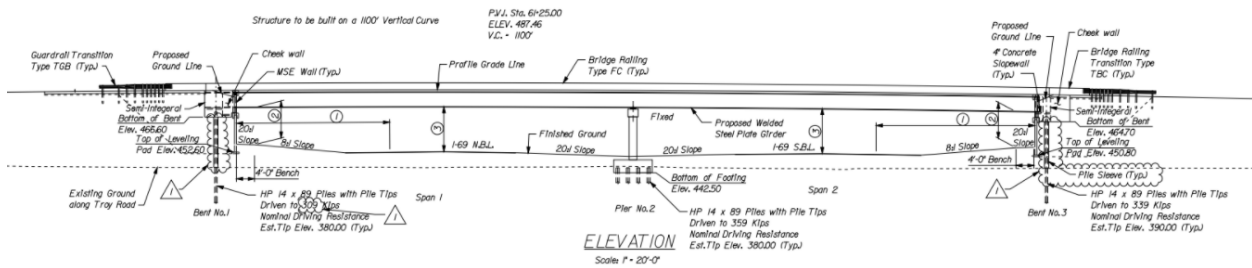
Elevation View of Structure I69-057-09506 (NBI 80226) (INDOT, 2010)
